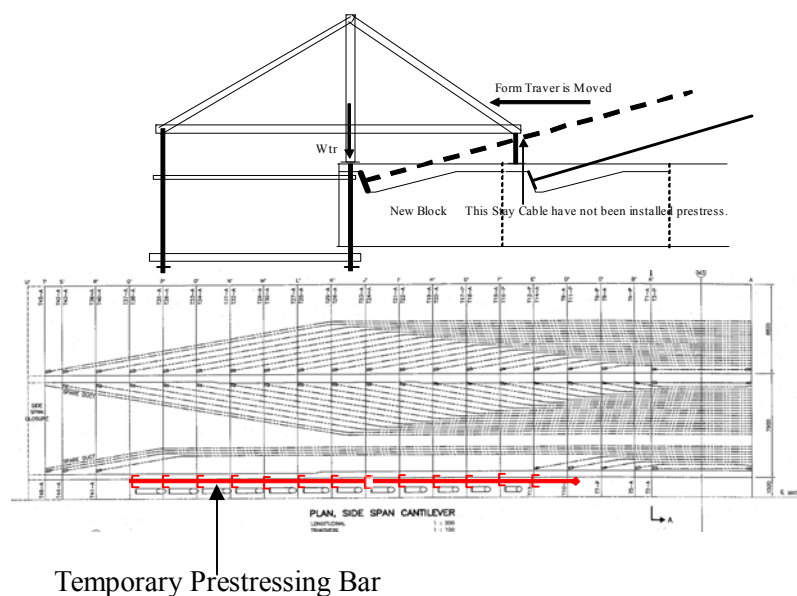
Temporary Prestressing Bar in Cantilever Erection
